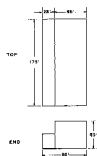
PERSPECTIVE VIEW AND DIMENSIONS OF POSSIBLE INSPECTION BUILDING (item 27, Figure 3).
